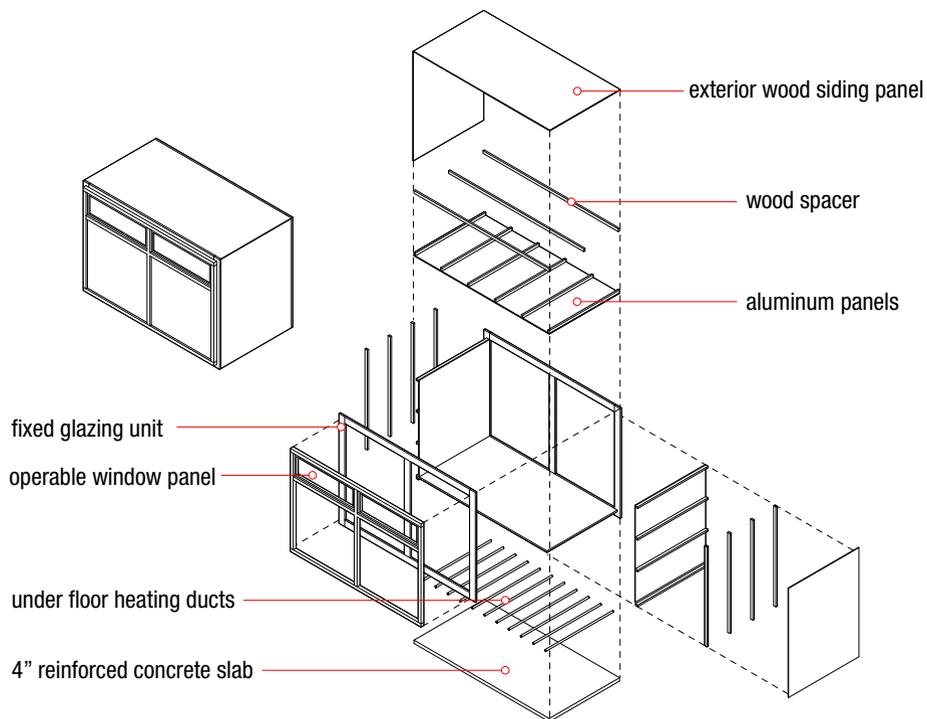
Exploded axonometric of module components (Kim, 2018)
